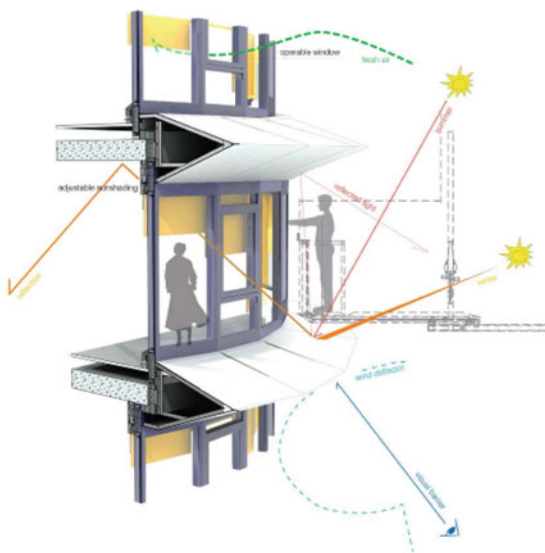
Natural Ventilation, Sun Shading, Low Tech and Dynamic Façade. Low Tech Architecture- Façade Architecture, Building Design-Auditorium Natural Ventilation. Source <https://www.bdonline.co.uk>. Dynamic Facades: The Story. Source <https://www.arch2o.com>
